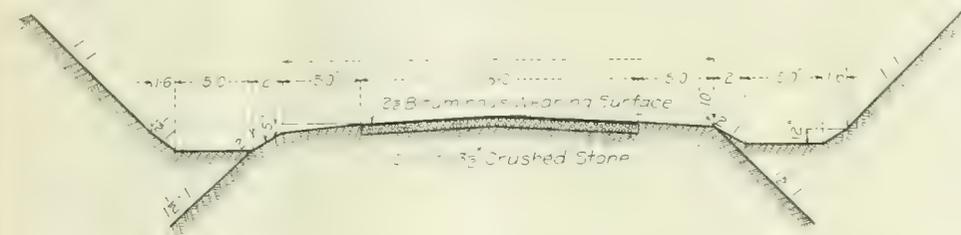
Cross Sections of the Dallas-Ft. Worth Road in Dallas County, Texas.
